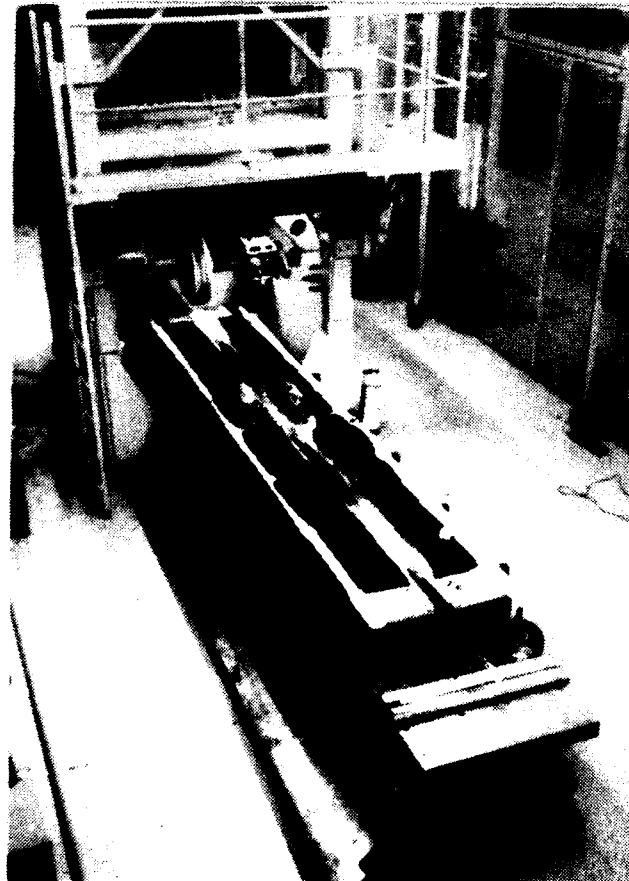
BIRD'S EYE VIEW OF TEST SETUP SHOWING TEST PAVEMENT CHANNELIZATION AND RUTTING.
